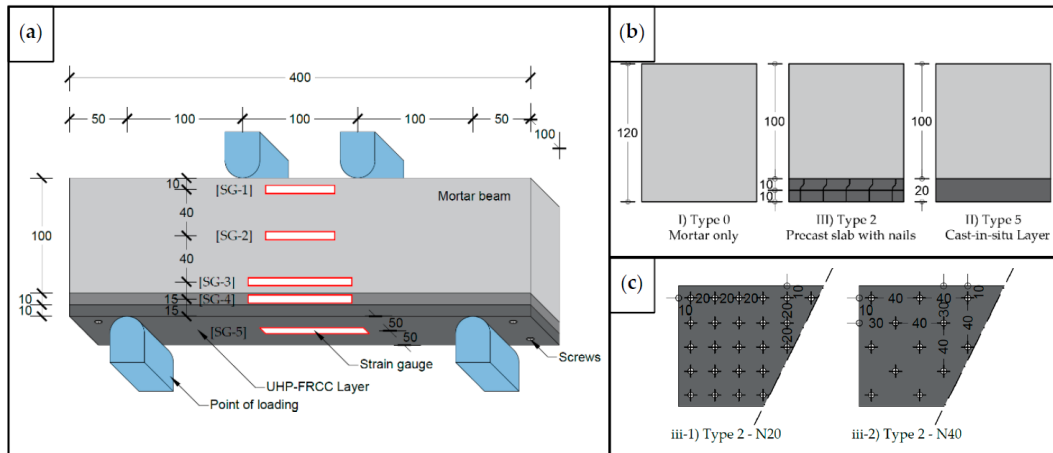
Mortar beams retrofitted by UHP-FRCC layer. (a) Specimens shape, strain gauges arrangement, and test configuration regarding the first test campaign; (b) Precast UHP-FRCC layers used to reinforce concrete beams; (c) Nail density on the surface of the type 2 precast layers for improving the connection between the parts.
